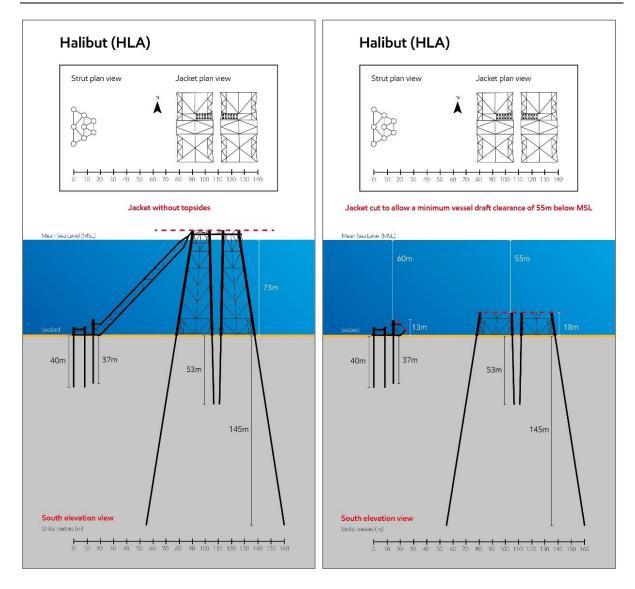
Halibut Steel Piled Jacket without topsides (left) and under proposed end state (right)
